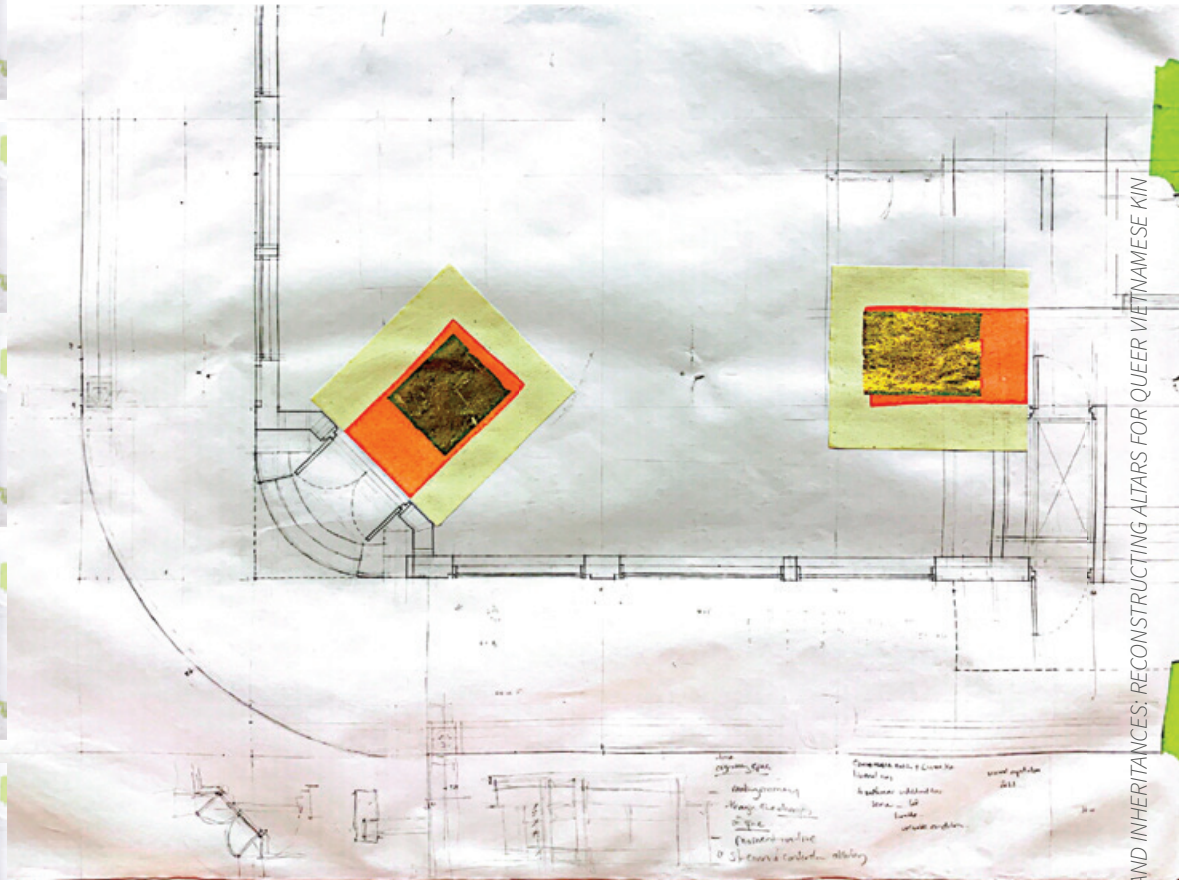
Drafted floor plan of the columbarium within 8 Wellesley St E. Existing plan of former coffee shop. By author, 2022
